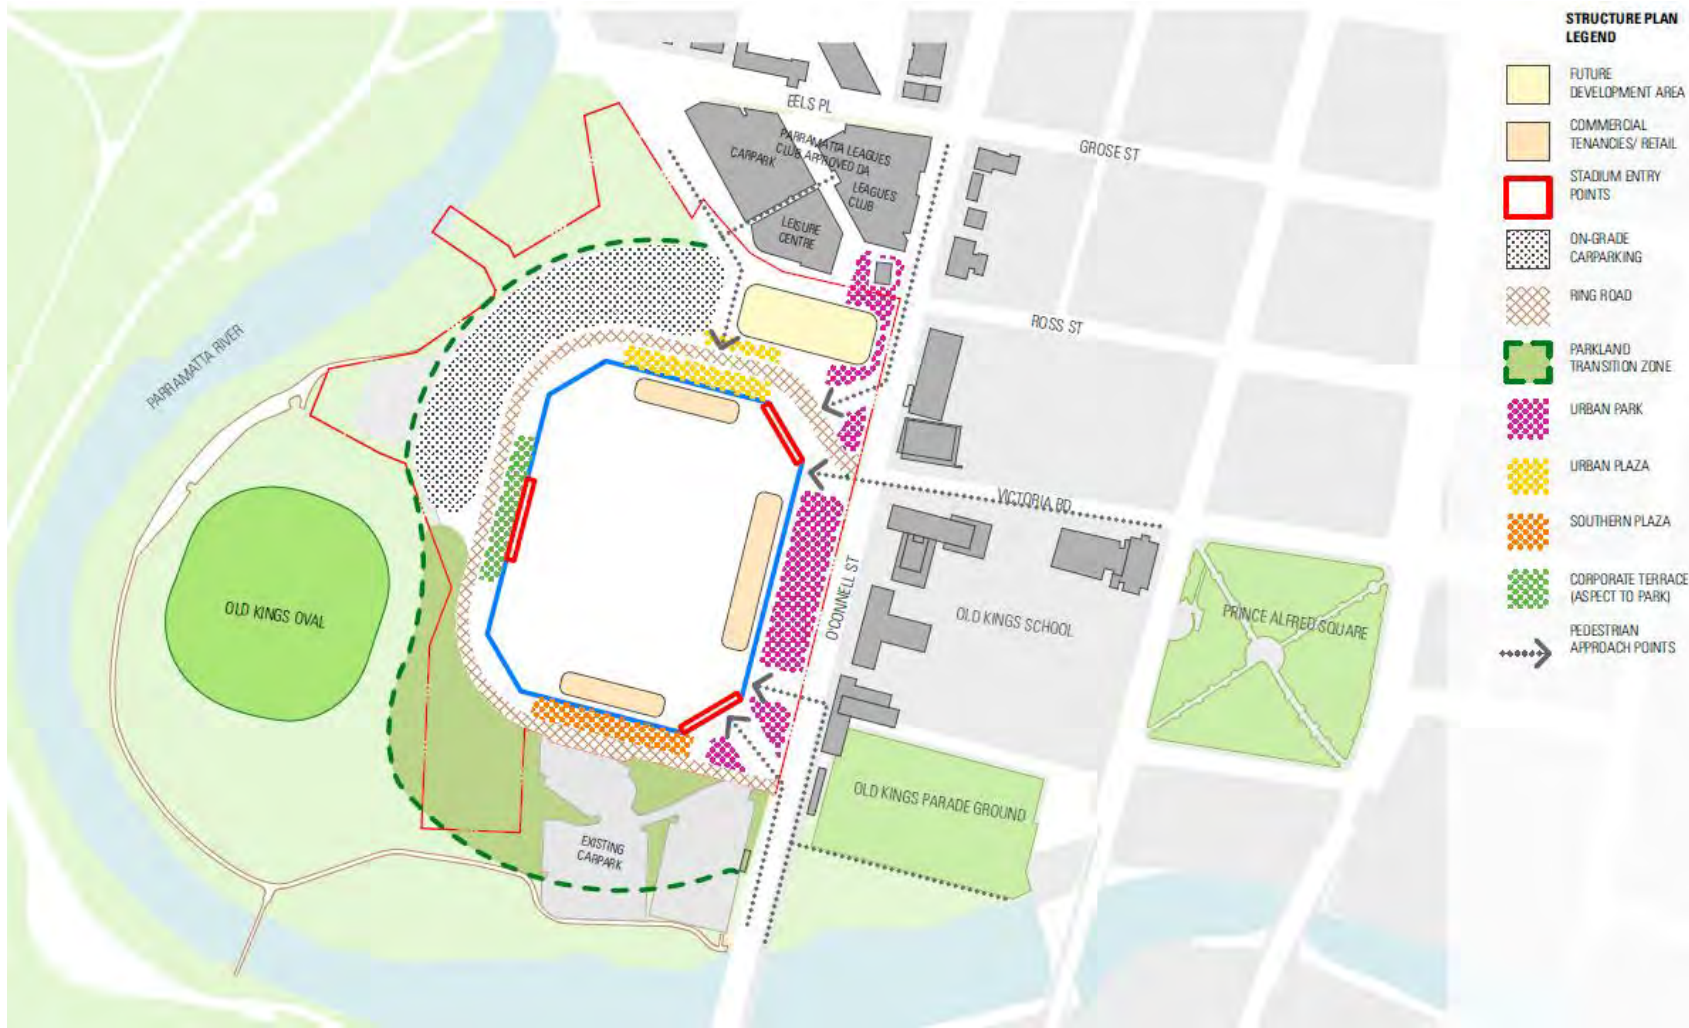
Western Sydney Stadium Concept Proposal– Structure Plan
